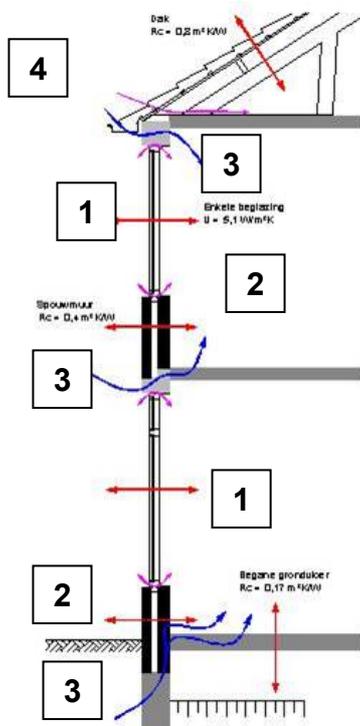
Section of a single family row house showing thermal deficiencies: Single pane windows [1], Cavity wall without thermal insulation [2], Thermal bridges [3] and Thermal leaks [4].
